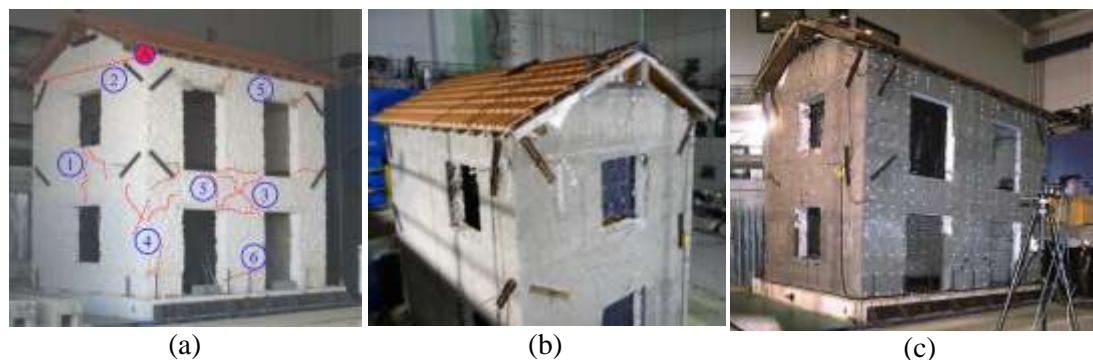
(a) Cracks of unreinforced masonry building; (b),(c) Reinforced building.
